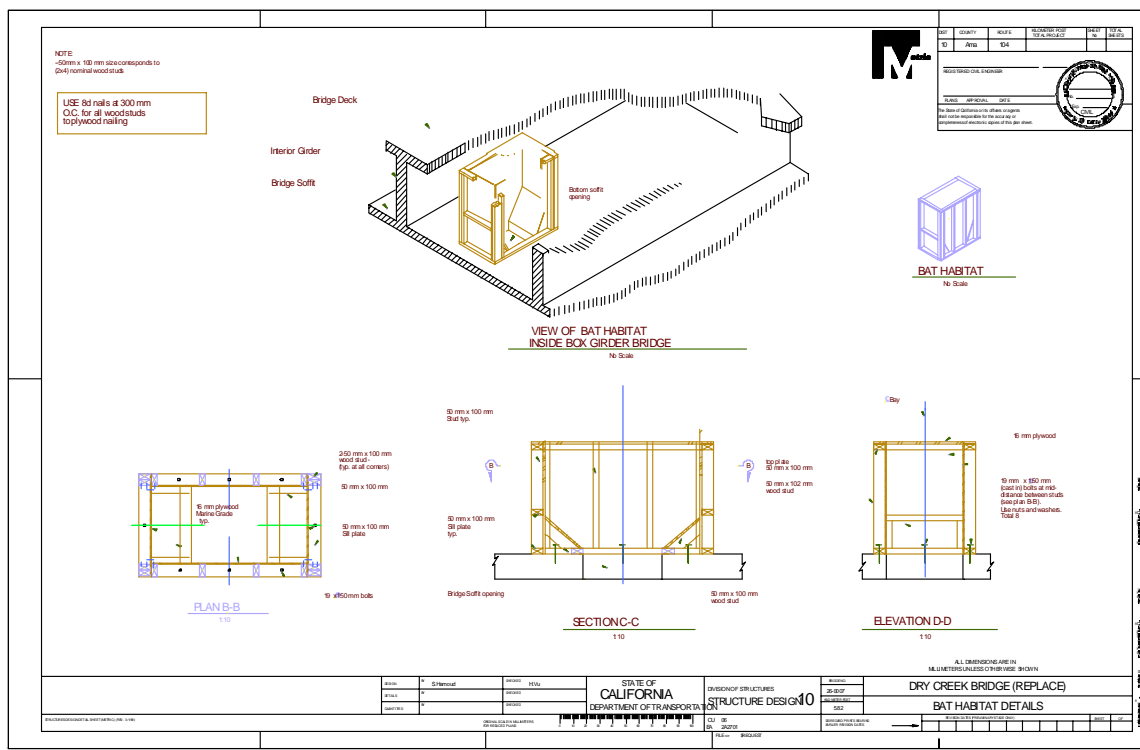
Caltrans engineers' design for bat box to be installed in new bridge.
